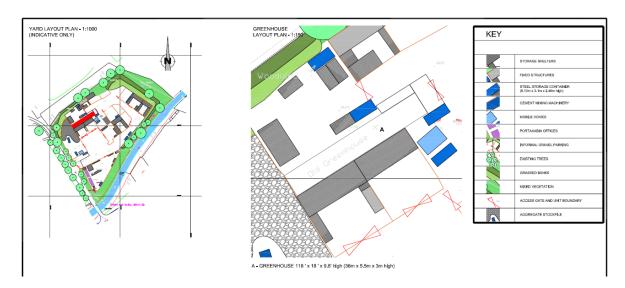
Site Layout Plan (LDC ref. 14/16053/LDE)
